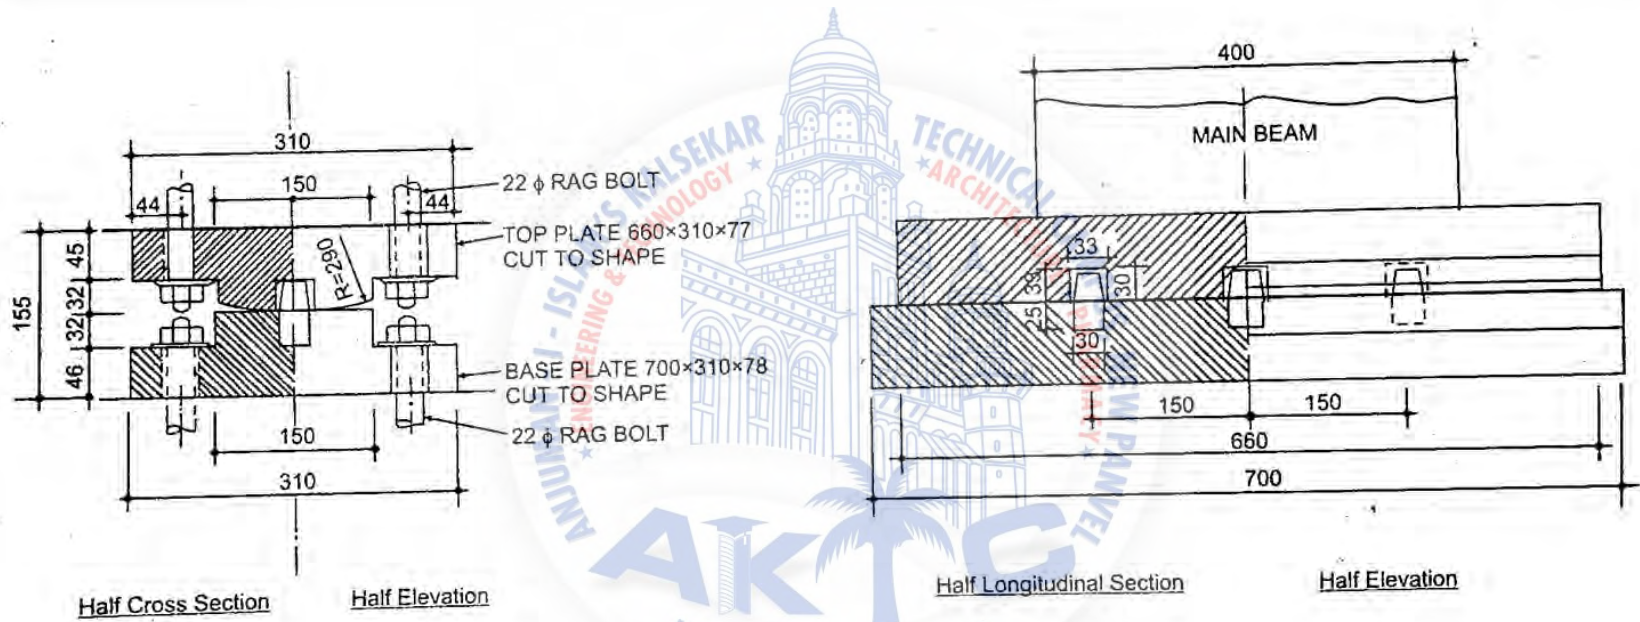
Mild Steel Rocker Bearing of 1250 kN Capacity.
